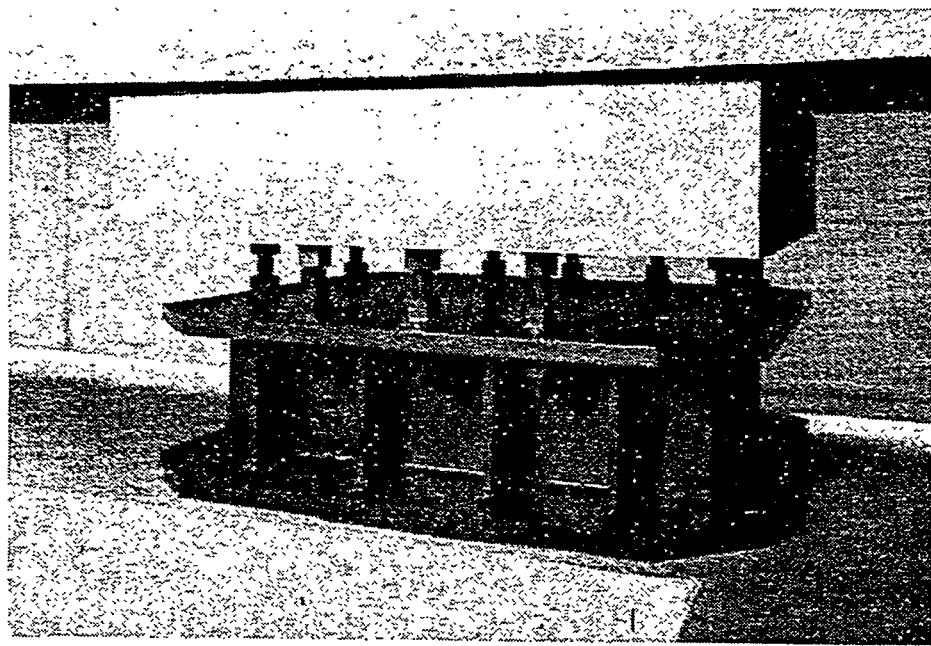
Fail-Safe Concrete Blocks in Kajima Isolation System
